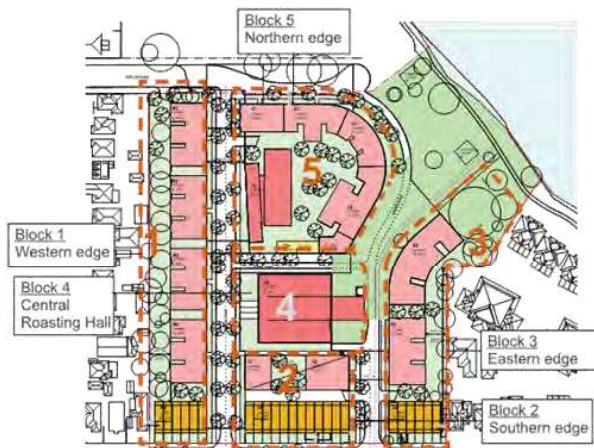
Key buildings identified over the Roof Plan amended PP (Sept 2019) (Source: BVN 2019)
